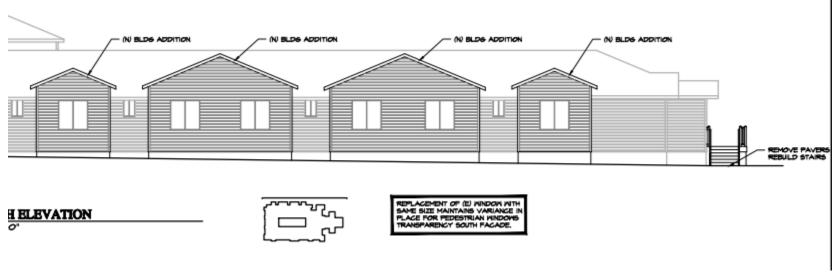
Proposed Modifications to North Elevation – Enlargement
